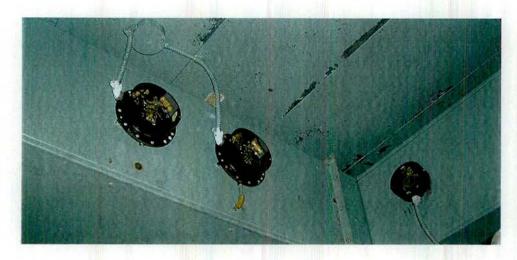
Black metal boxes containing mercury switches on warm-air duct in the generator room (Site 330, September 6, 2000).
